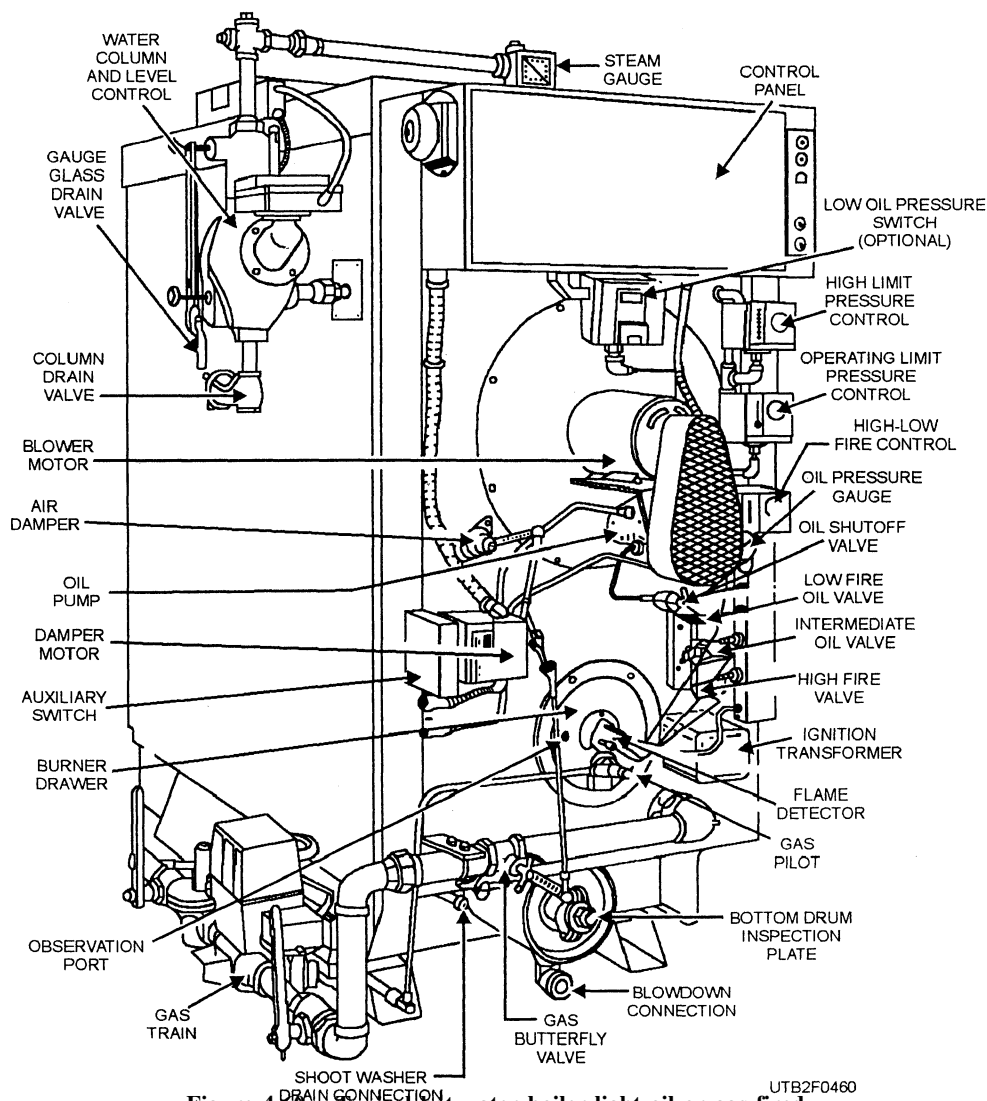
Typical hot-water boiler-light oil or gas fired.
